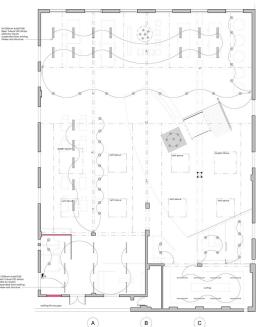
First floor lighting & ceiling plan-not to scale (Author 2013)
